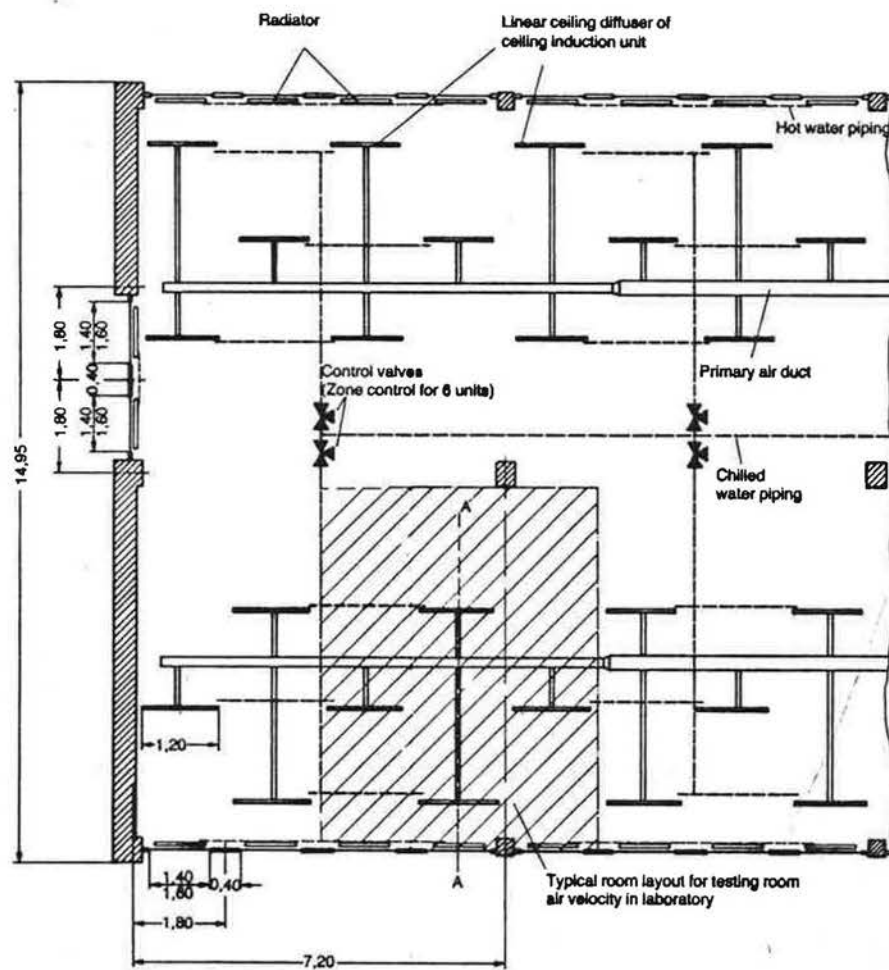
Drawing of a part of an office building -- the hatched section is to be built up in the test room
